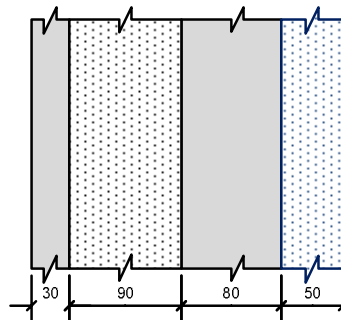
Retrofit insulation on inner surface of a concrete sandwich wall.
